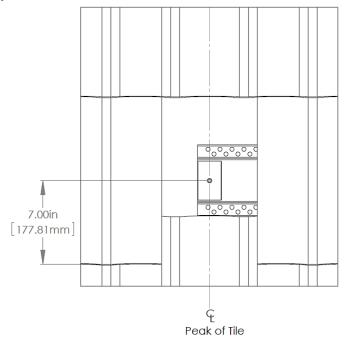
W Tile Installation (Rafter East Orientation Shown) Layout Dimensions Same in East or West Rafter Orientation
